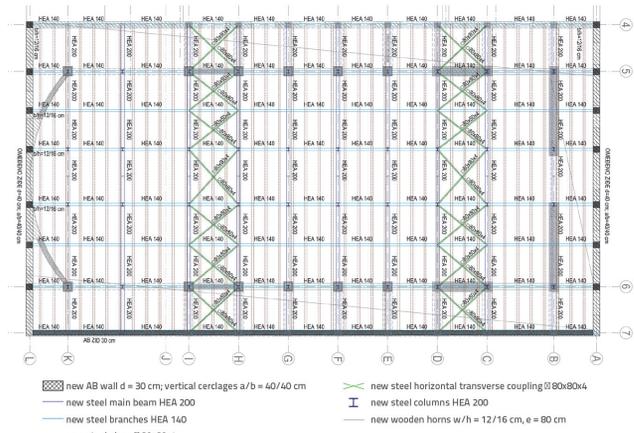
Construction of the upper belt of the new steel structure of the hall roof [11]
